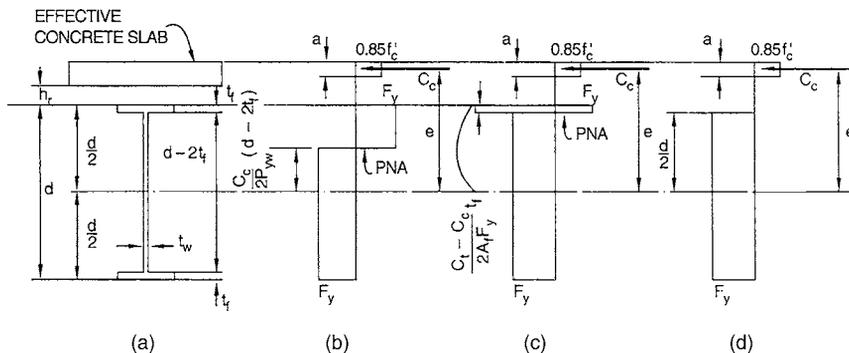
Stress distributions assumed for plastic design of a composite beam. (a) Cross section of composite beam. (b) Plastic neutral axis (PNA) in the web. (c) PNA in the steel flange. (d) PNA in the slab.
